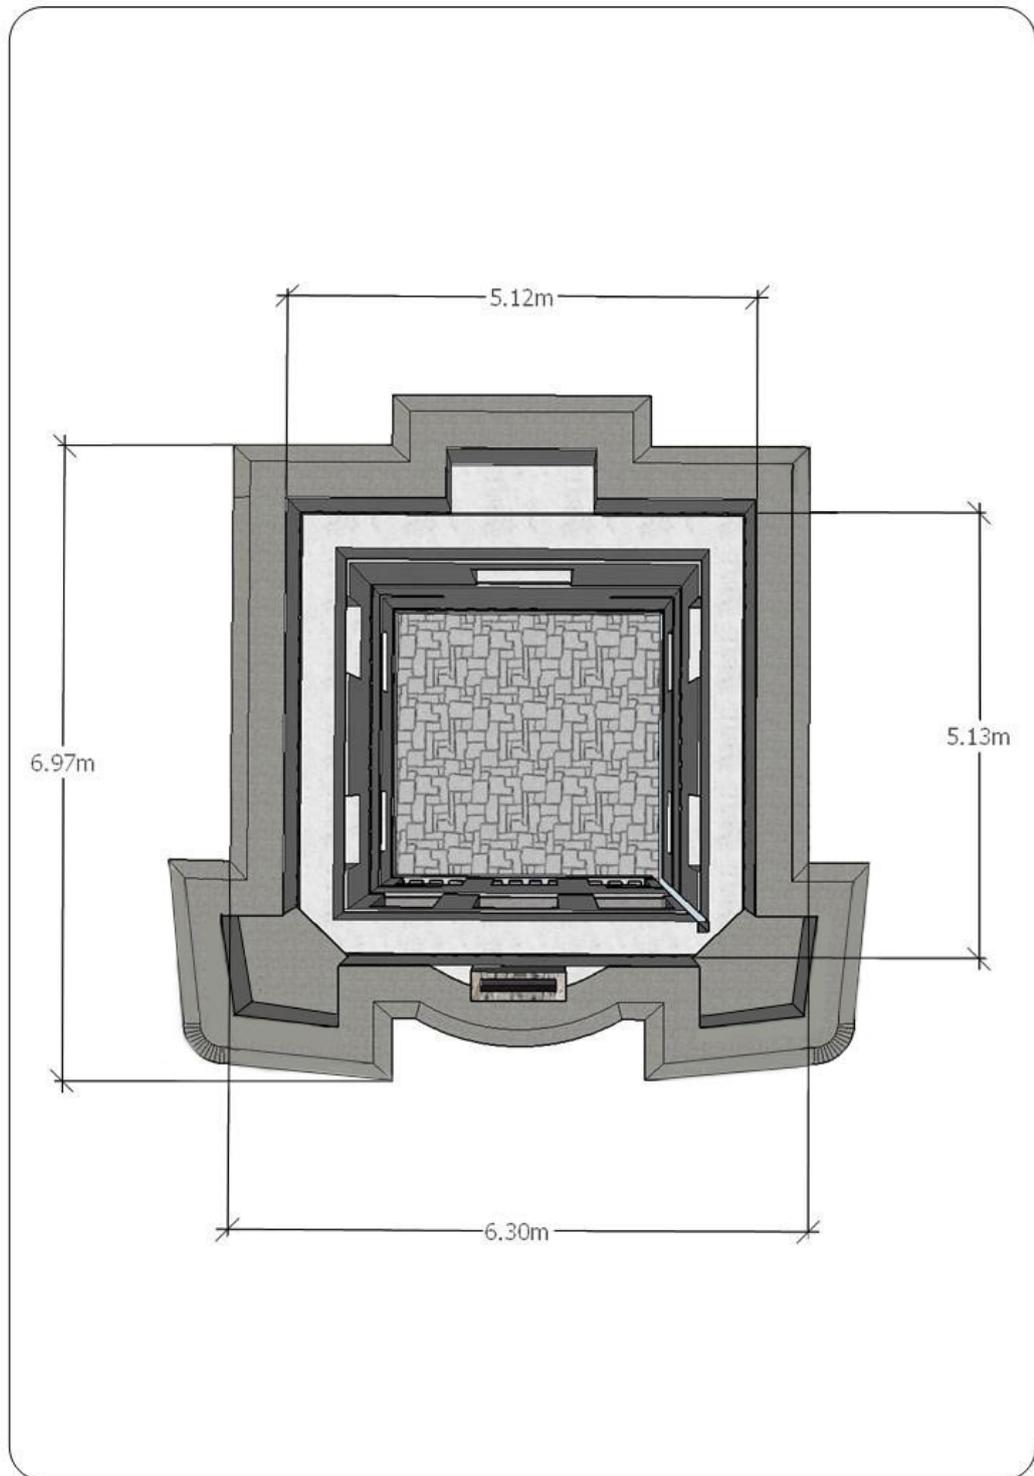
Plan view of rendered 3D model for an idealised signal tower showing access points to machicolation and bartizans and the ledge upon which the roof was set.
